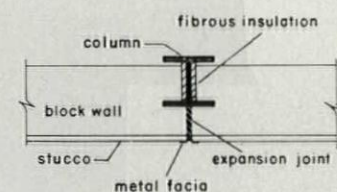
Columns in outside wall joints cause cracks in long walls and in interior partition joints. Outside walls should preferably be free to move.
